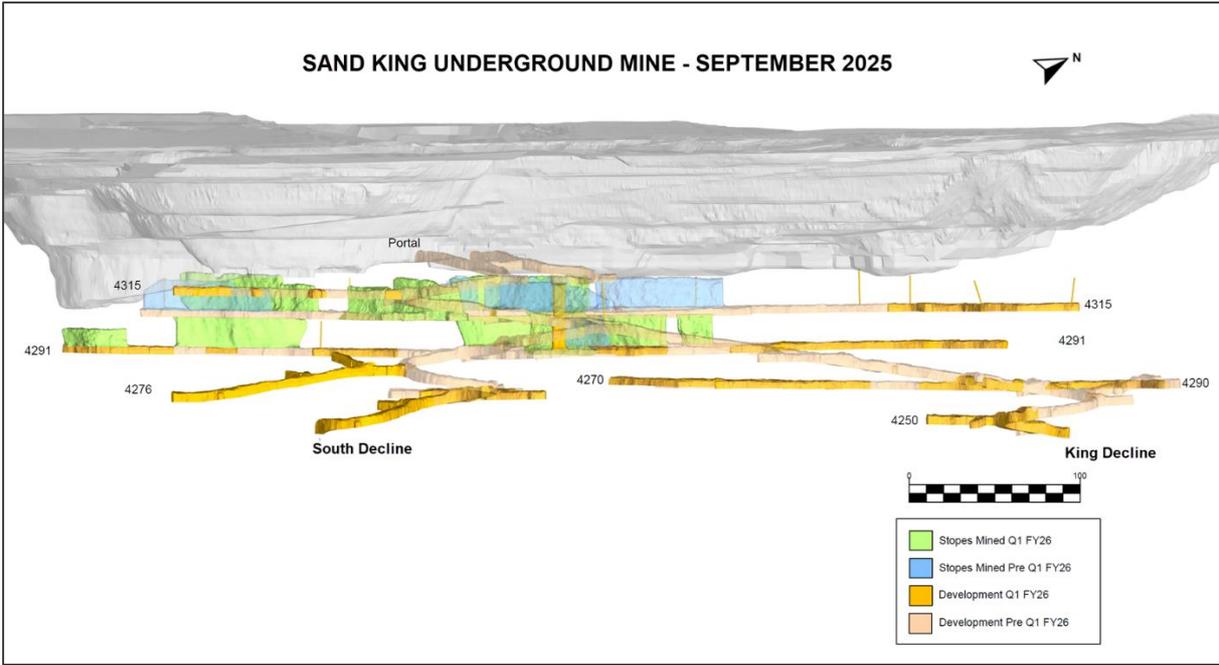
Sand King Underground long section showing actual development and underground mine design
